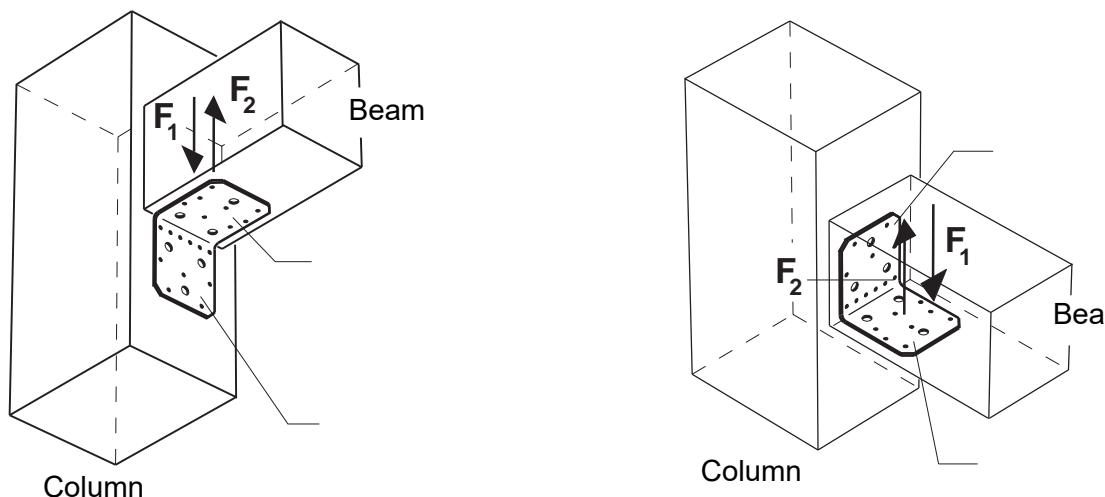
Beam to column connection – Angle Bracket with a rib
